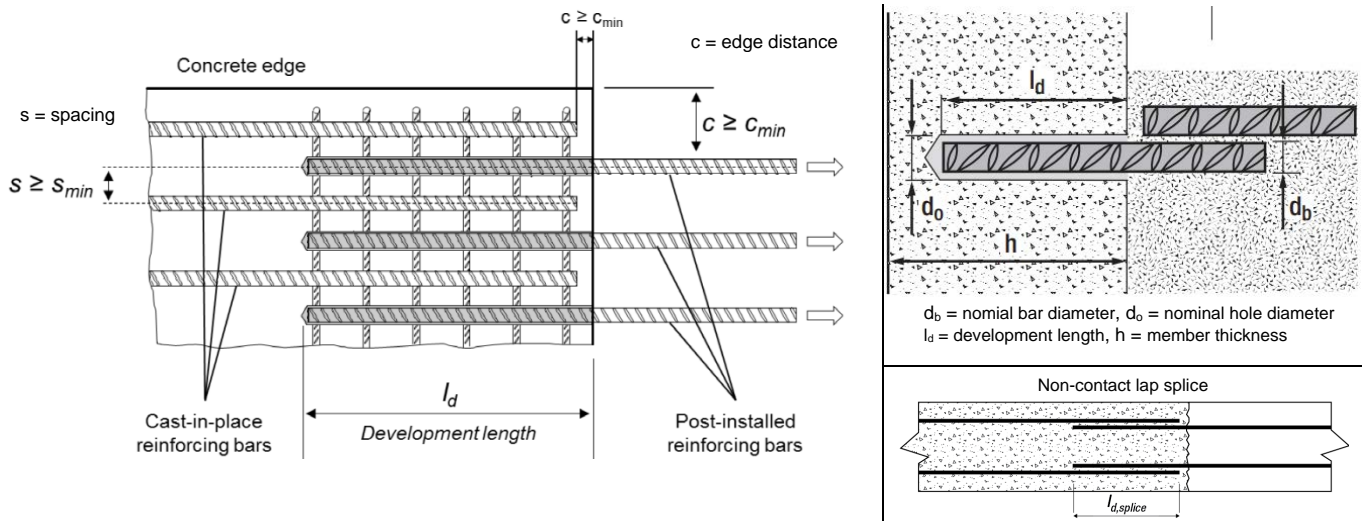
INSTALLATION DETAIL FOR POST-INSTALLED REINFORCING BAR CONNECTIONS (Top Pictures), EXAMPLES OF DEVELOPMENT LENGTH APPLICATION DETAILS FOR POST-INSTALLED REINFORCING BAR CONNECTIONS PROVIDED FOR ILLUSTRATION (Bottom Pictures)
